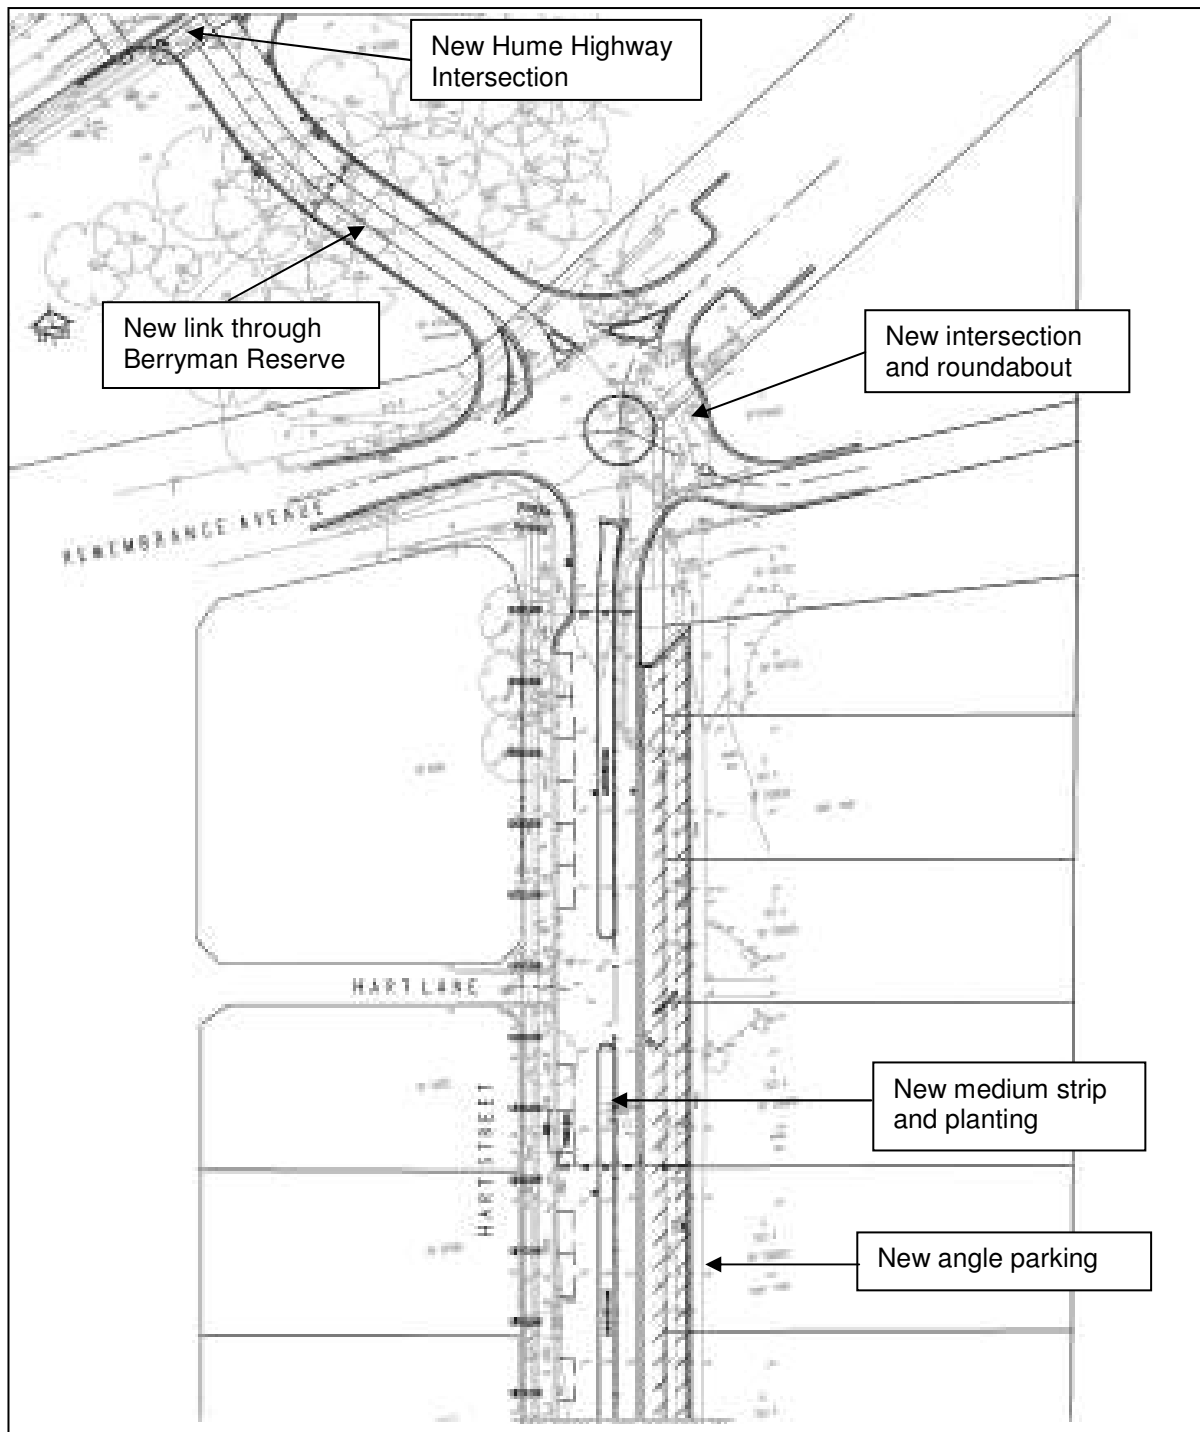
Detail of new works to Hart Street and Intersection with the Hume Highway
